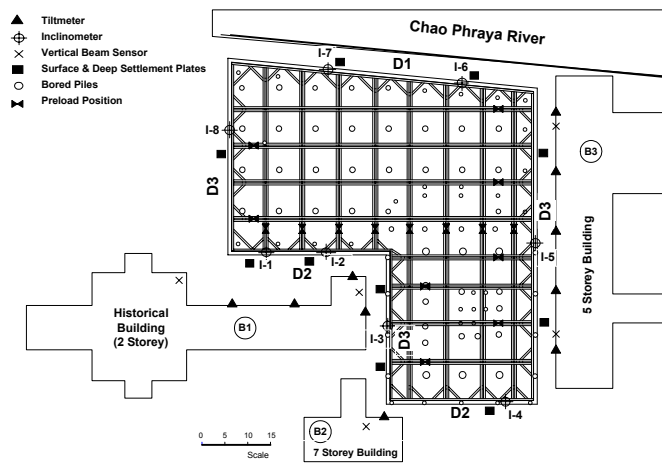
Layout of temporary bracing and instrumentation (First Building)
